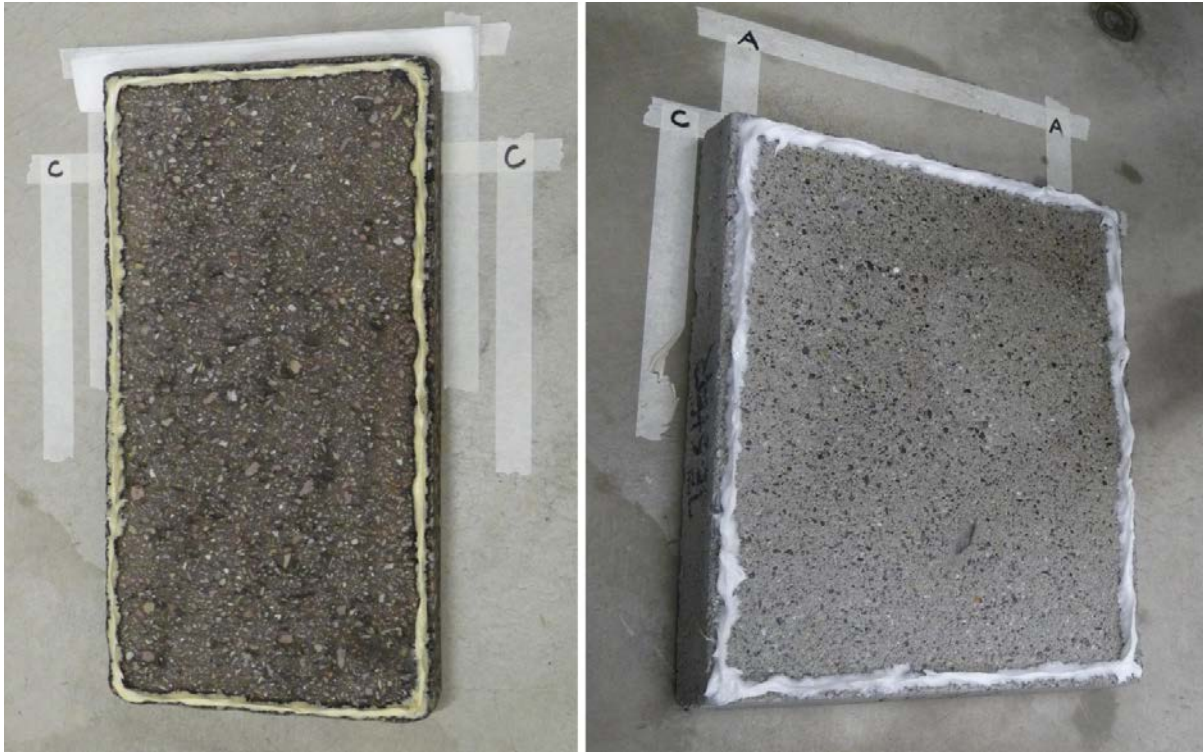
Asphalt (left) and concrete (right) pavement samples
